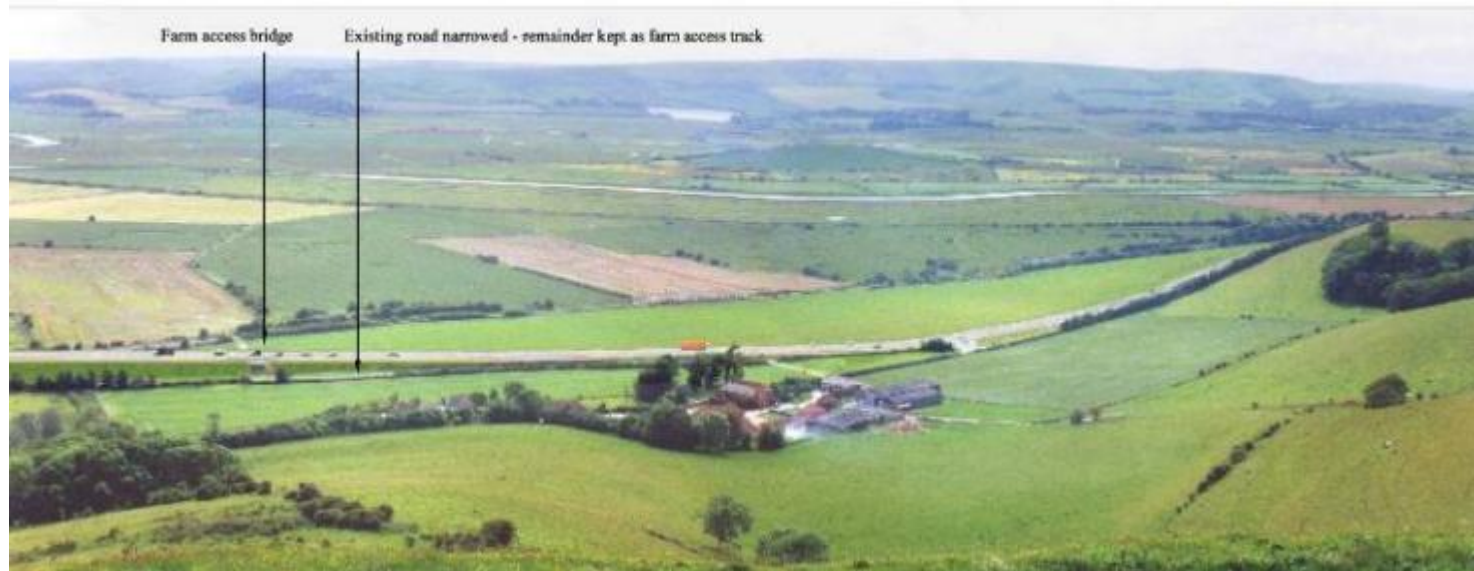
Photomontage view to south west from Mount Caburn, One Year After Opening
